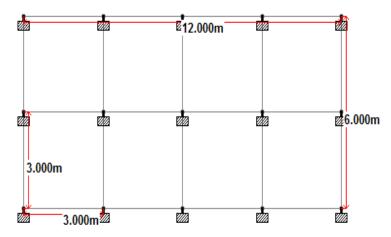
Plan of buildings frames for all cases of Groups (1, 2, 3)
